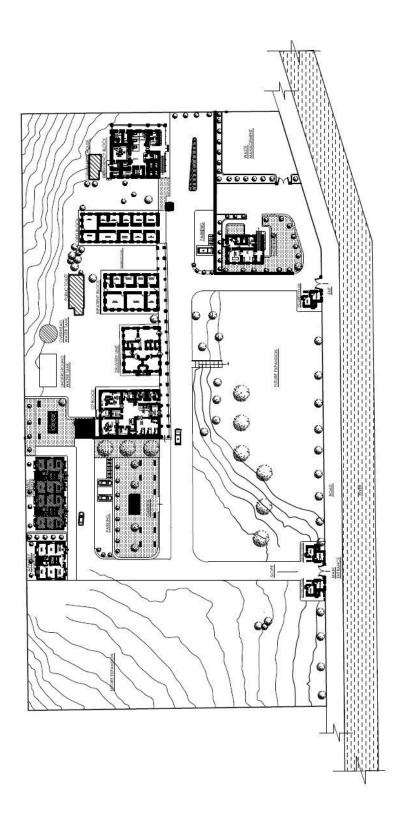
Master Plan depicting the immediate interventions and future expansions (Starting point for the intervention under short term Plan)
